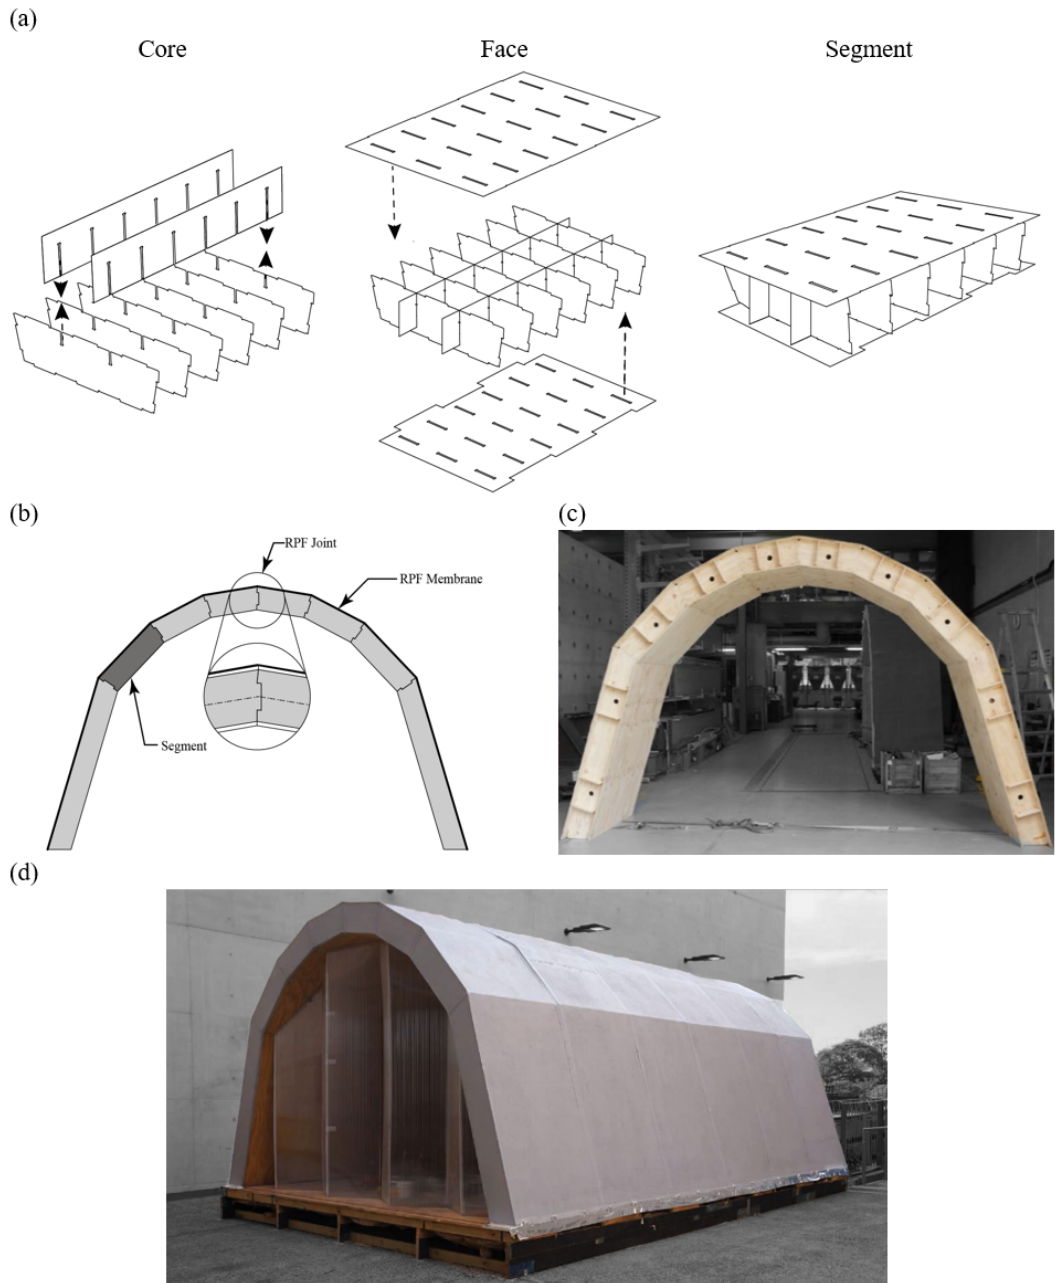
(a) Isometric view of exploded cores, assembled cores with top and bottom face and assembled sandwich panel segment, (b) folded state of the arch with a continuous FRP layer bonded to the top, (c) single arch structure, and (d) full house structure.
